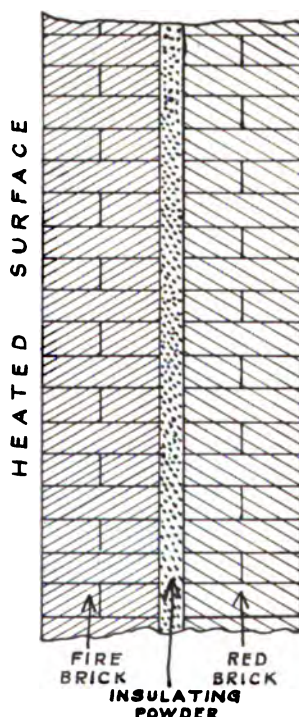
TYPICAL WALL CONSTRUCTION, SHOWING INSULATING POWDER IN HOLLOW WALL.
